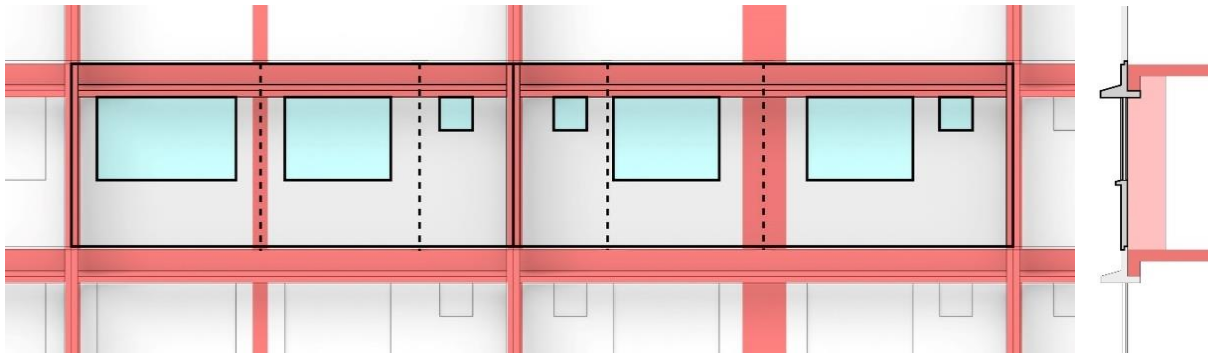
Elevation and section of facade highlighting structural beams and columns.
